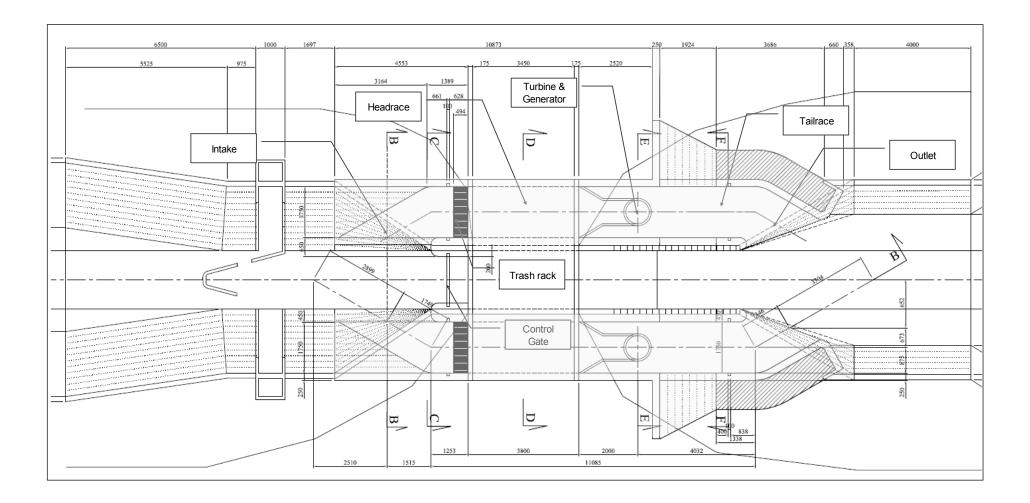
General Plan of Lateral-B Hydropower Development
